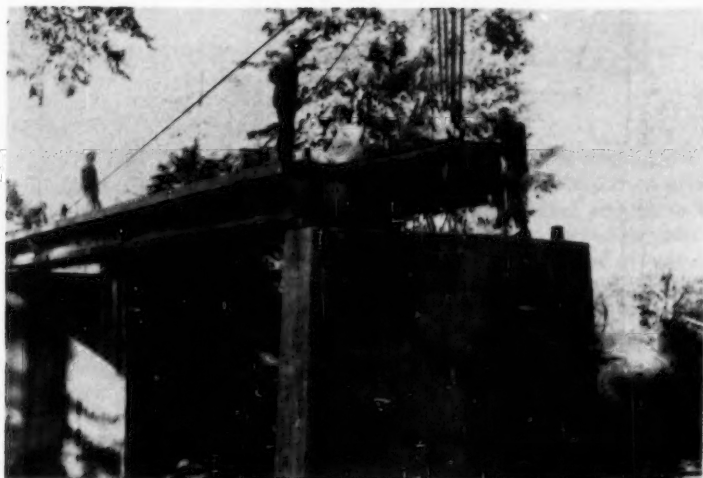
Rainbow Falls State Park Bridge. Erection of 60-foot pretensioned girders with skyline.
